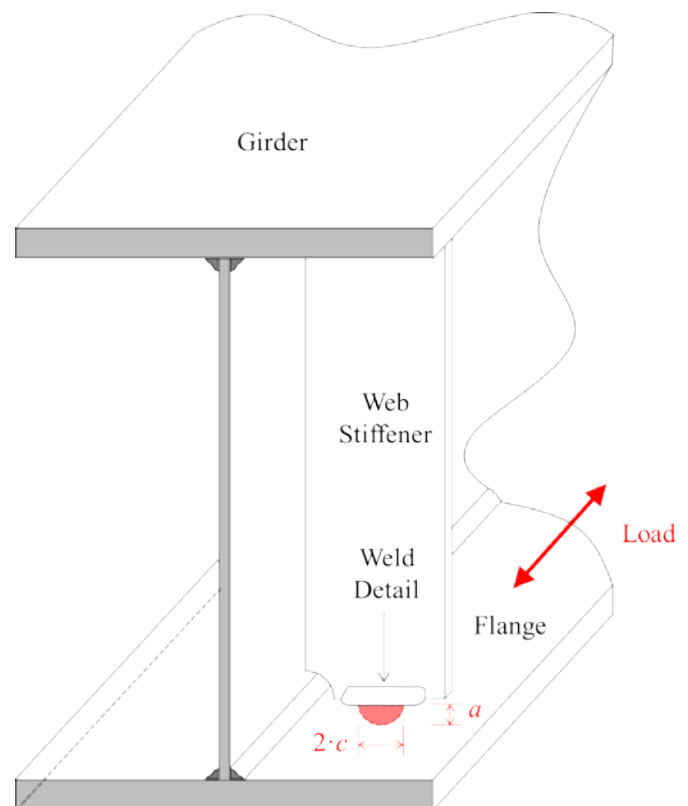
Investigated weld detail and initial crack geometry.
